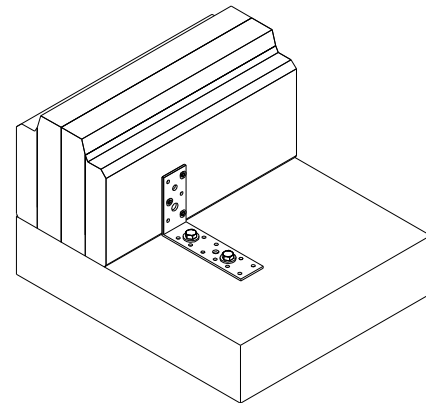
Connection between the first log and the foundation used by the Rusticasa system
